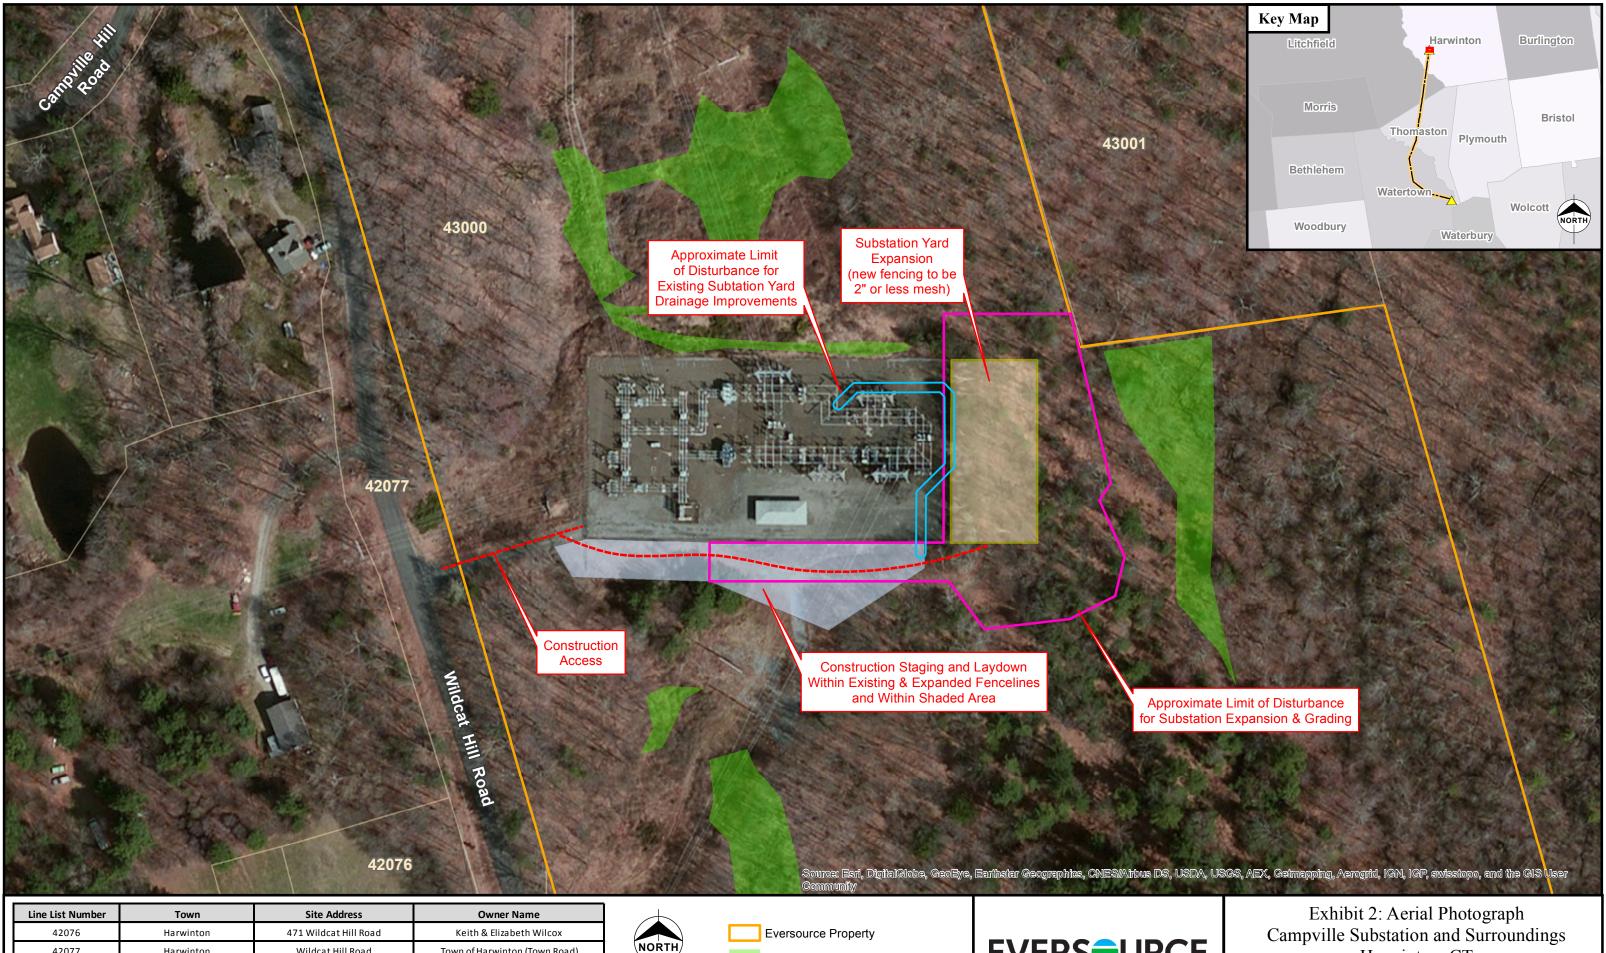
Aerial Photograph Campville Substation and Surroundings
